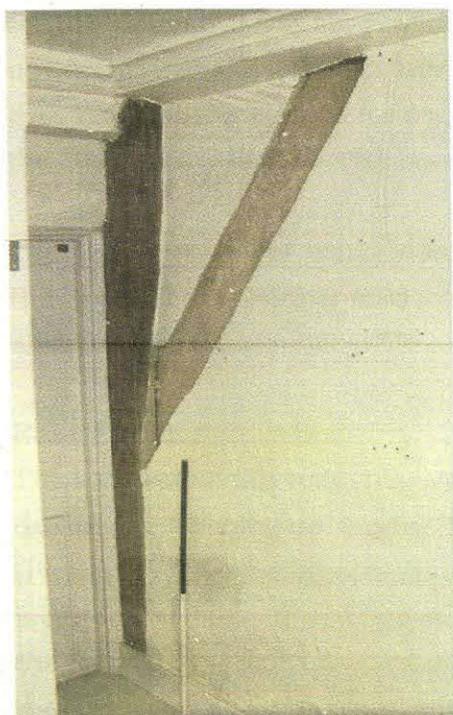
Exposed arch brace in Room F17 (scale 1.0m)
